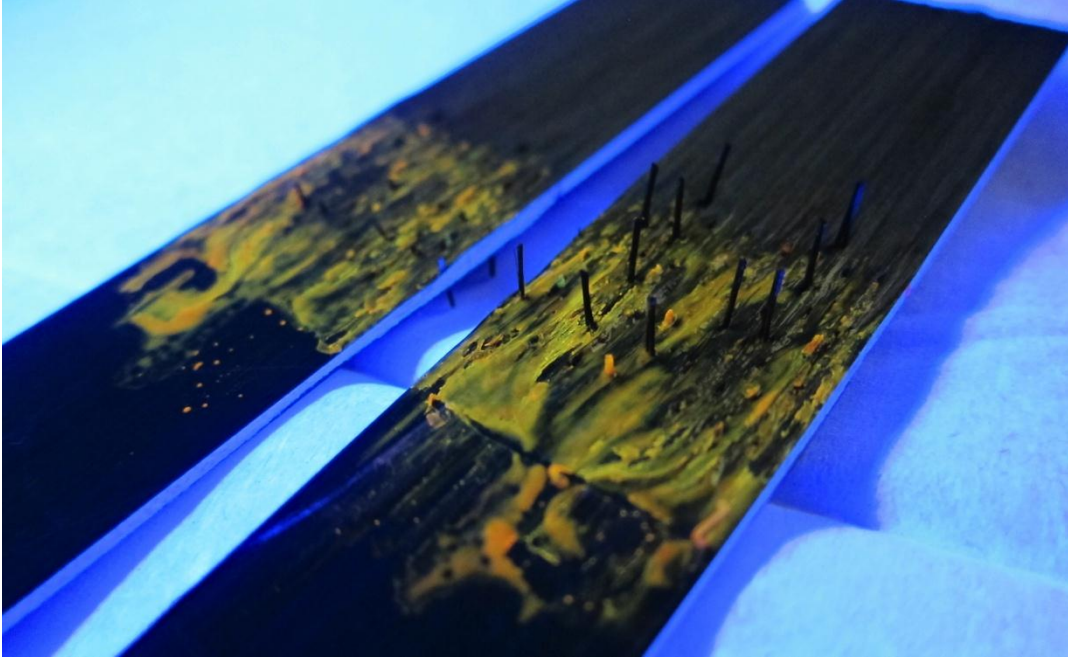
Ultraviolet light image of fracture plane for specimen 10B
